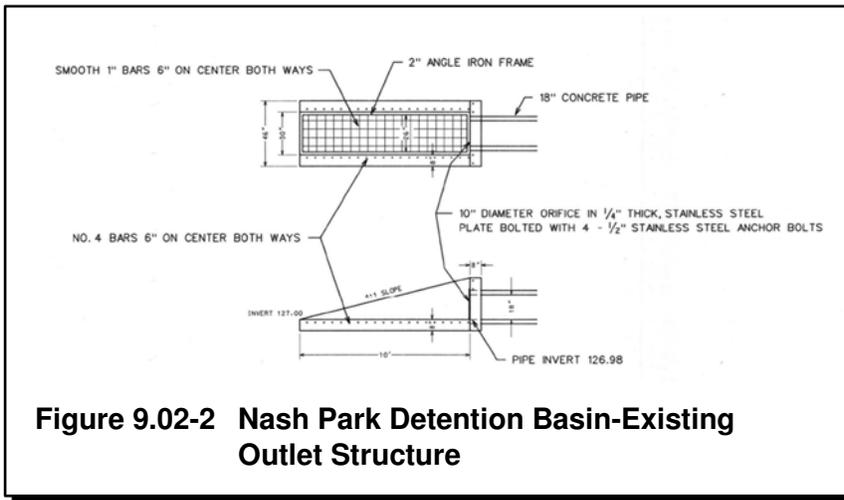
Nash Park Detention Basin-Existing Outlet Structure
